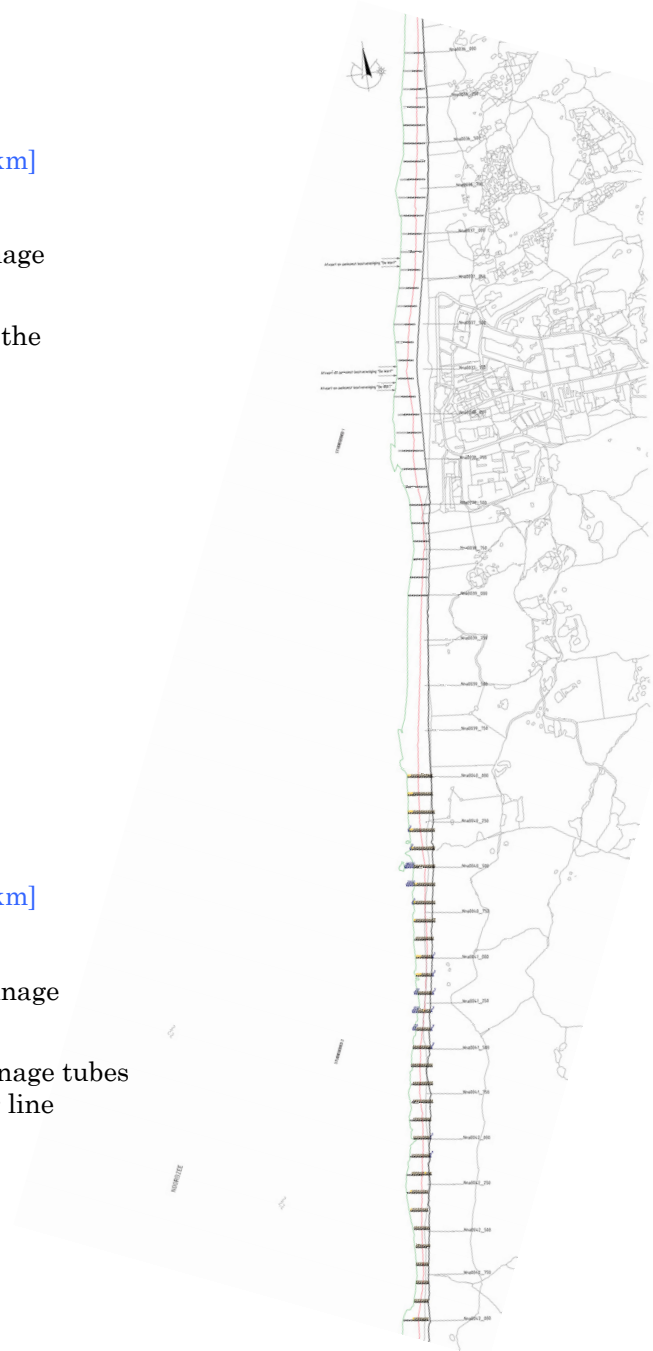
Installation layout of the drainage tube system at Egmond aan Zee
